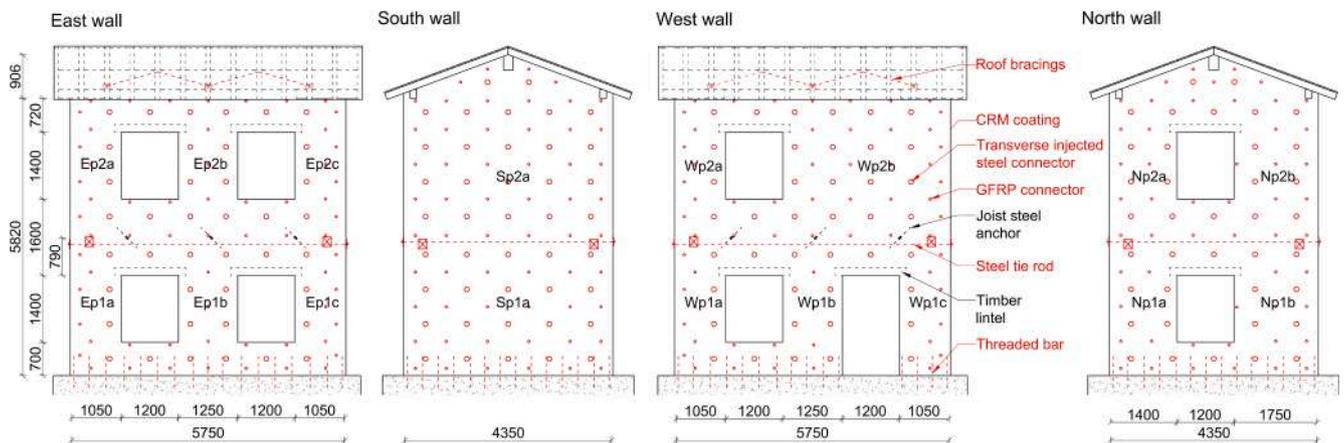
Side views of the building and coating connection details (dimensions in mm).
